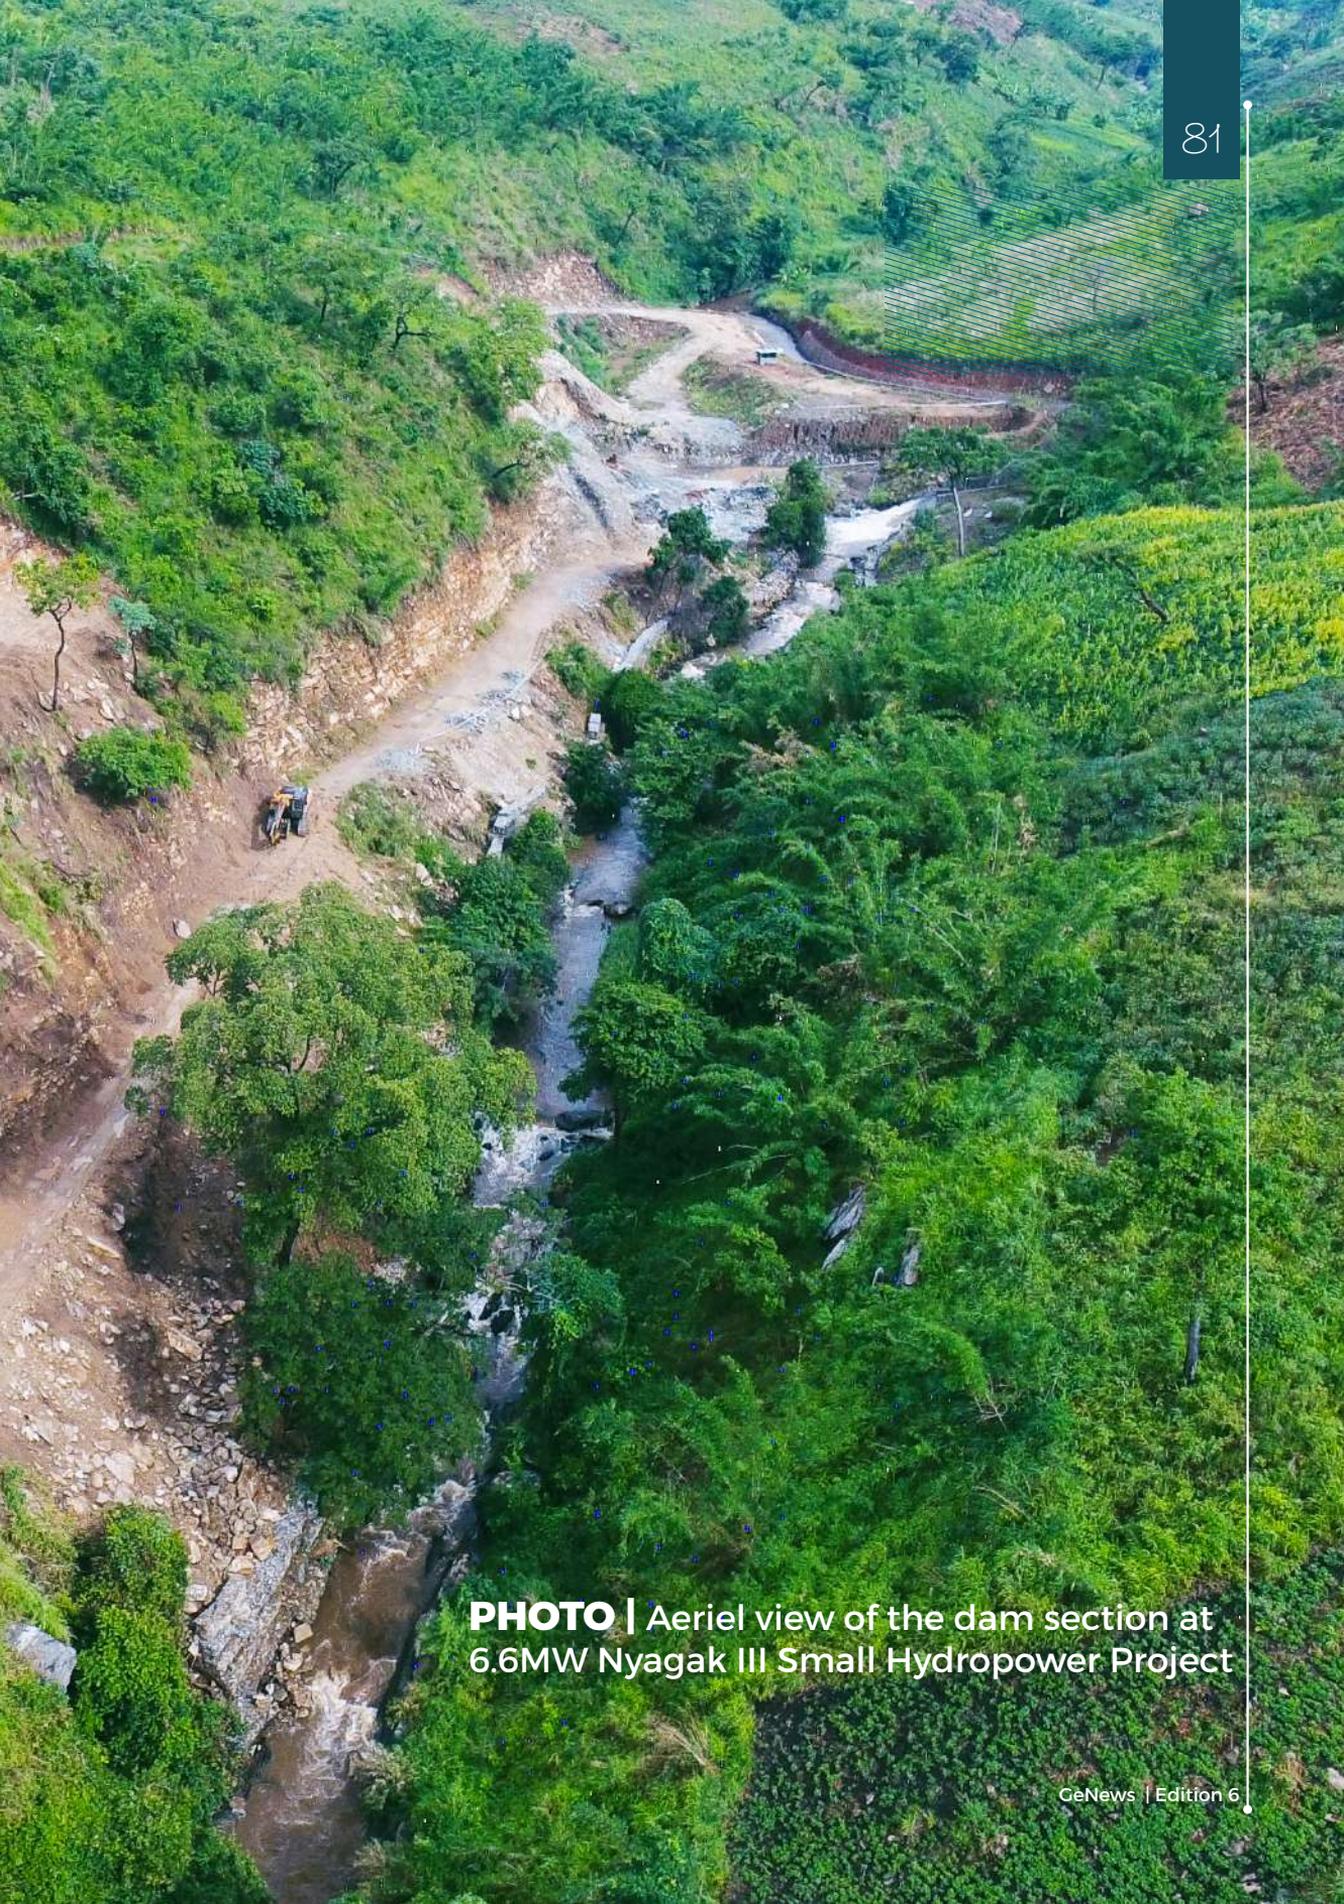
PHOTO | Aerial view of the dam section at 6.6MW Nyagak III Small Hydropower Project
